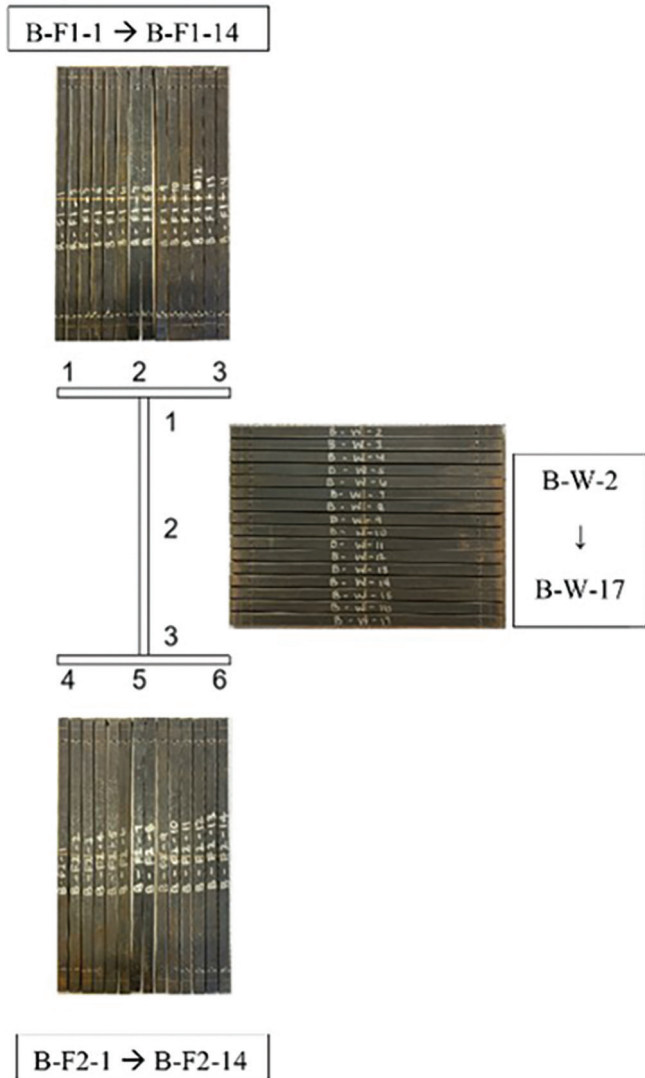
Fully sectioned specimen I 80 9.3-28R.
